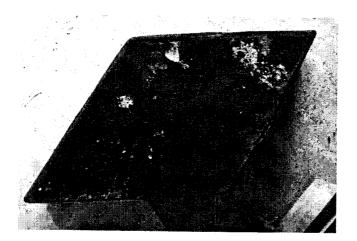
Diamond Shape Elastomeric Bearing Pad (Plan View)
